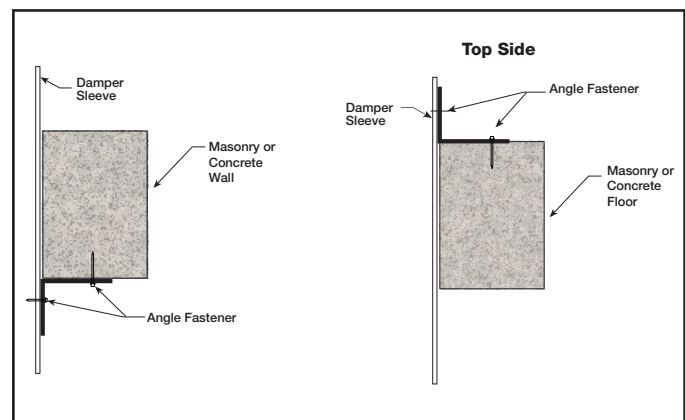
Single Side Angle With Masonry or Concrete Wall and Floor
